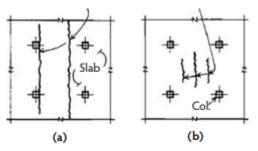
Reflected ceiling view of slabs illustrating crack formation in (a) posttensioned slab; (b) reinforced concrete slab. (Nawy, 2008)
